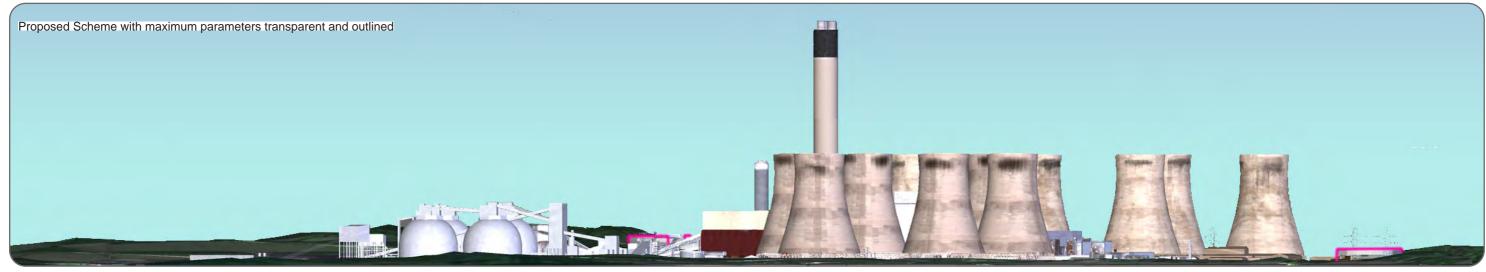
Orthographic elevation of existing vs Proposed Scheme looking north
